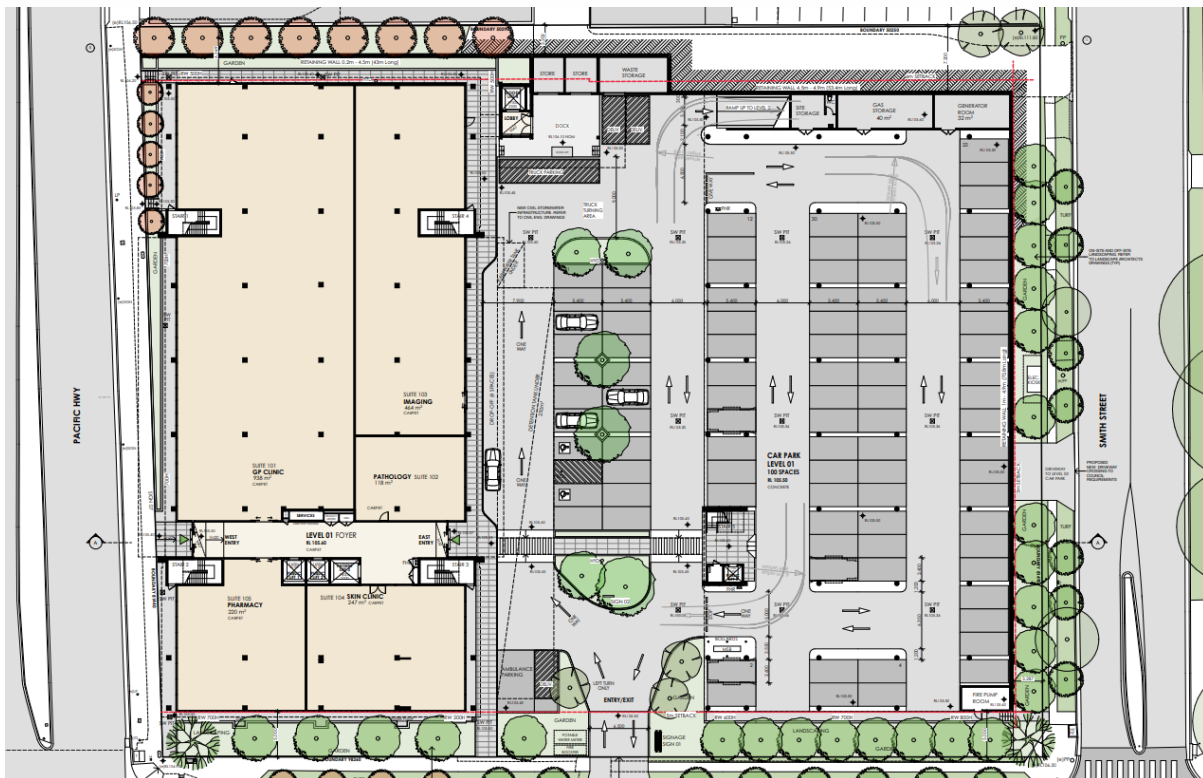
The plan of level 1 of the proposed development, facing north. (Source: Arcadia Landscape Architecture via Proponent).
